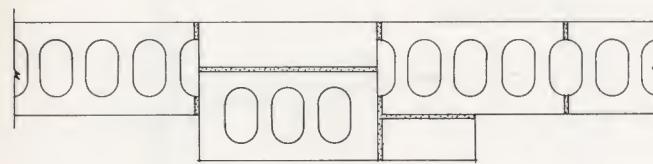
Methods of bonding brick facing to concrete masonry wall.
